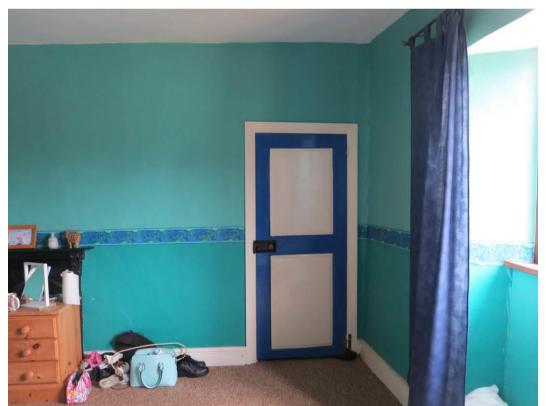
18th-century two-panel door to built-in cupboard in east wall of main body of house
